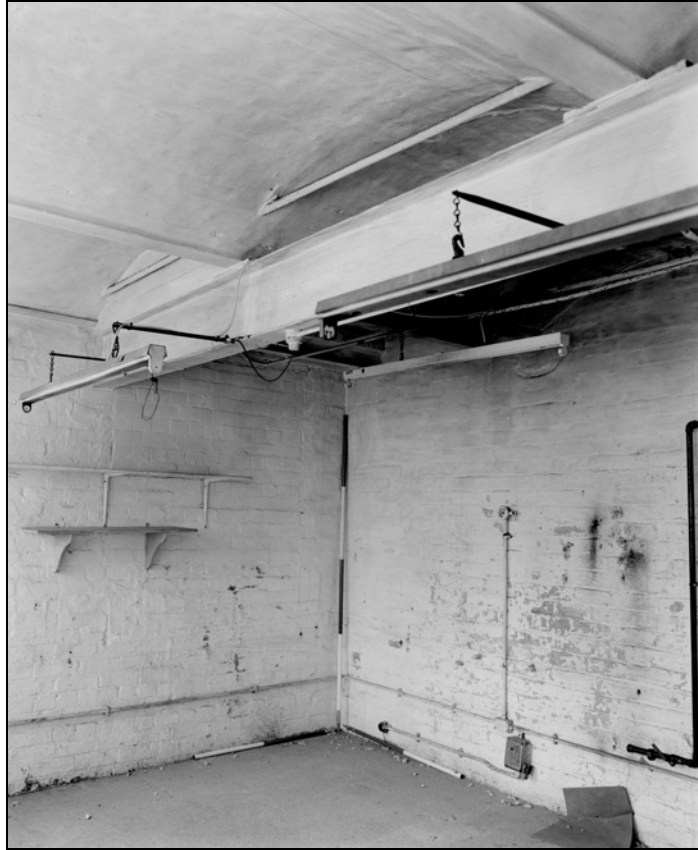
Building 1a, first floor; general shot of A16 showing blockings in SW wall (Film 3.10)
